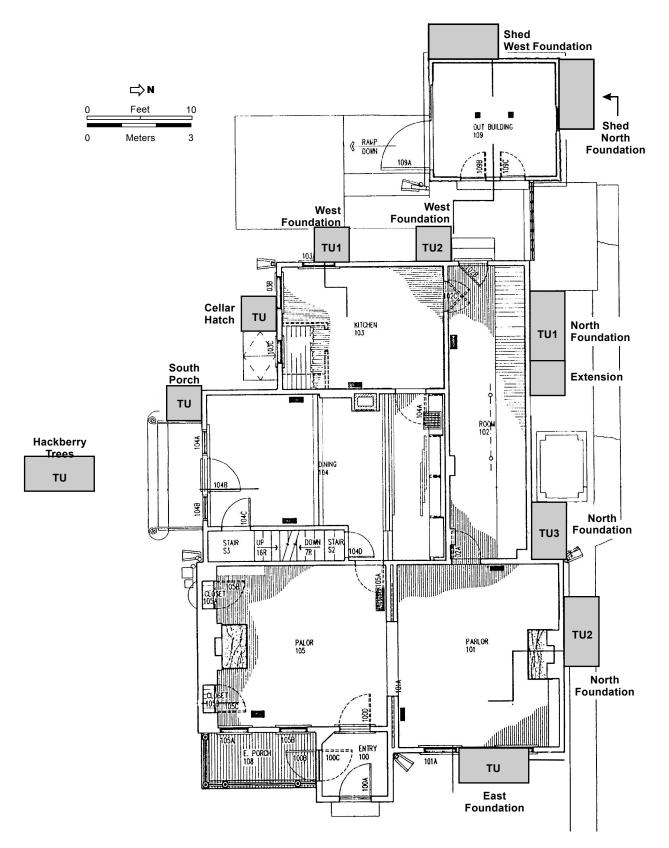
Harriet Dean House and the location of perimeter excavation units.
